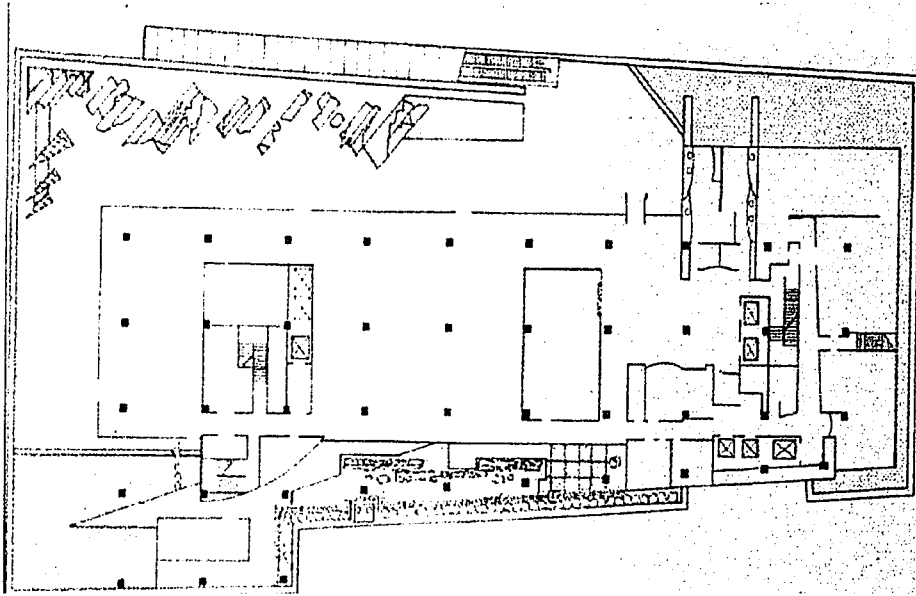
Moriyama & Teshima. Canadian Embassy - Place Canada, Tokyo, Japan, 1986-1991. Floor plan of the fourth floor
